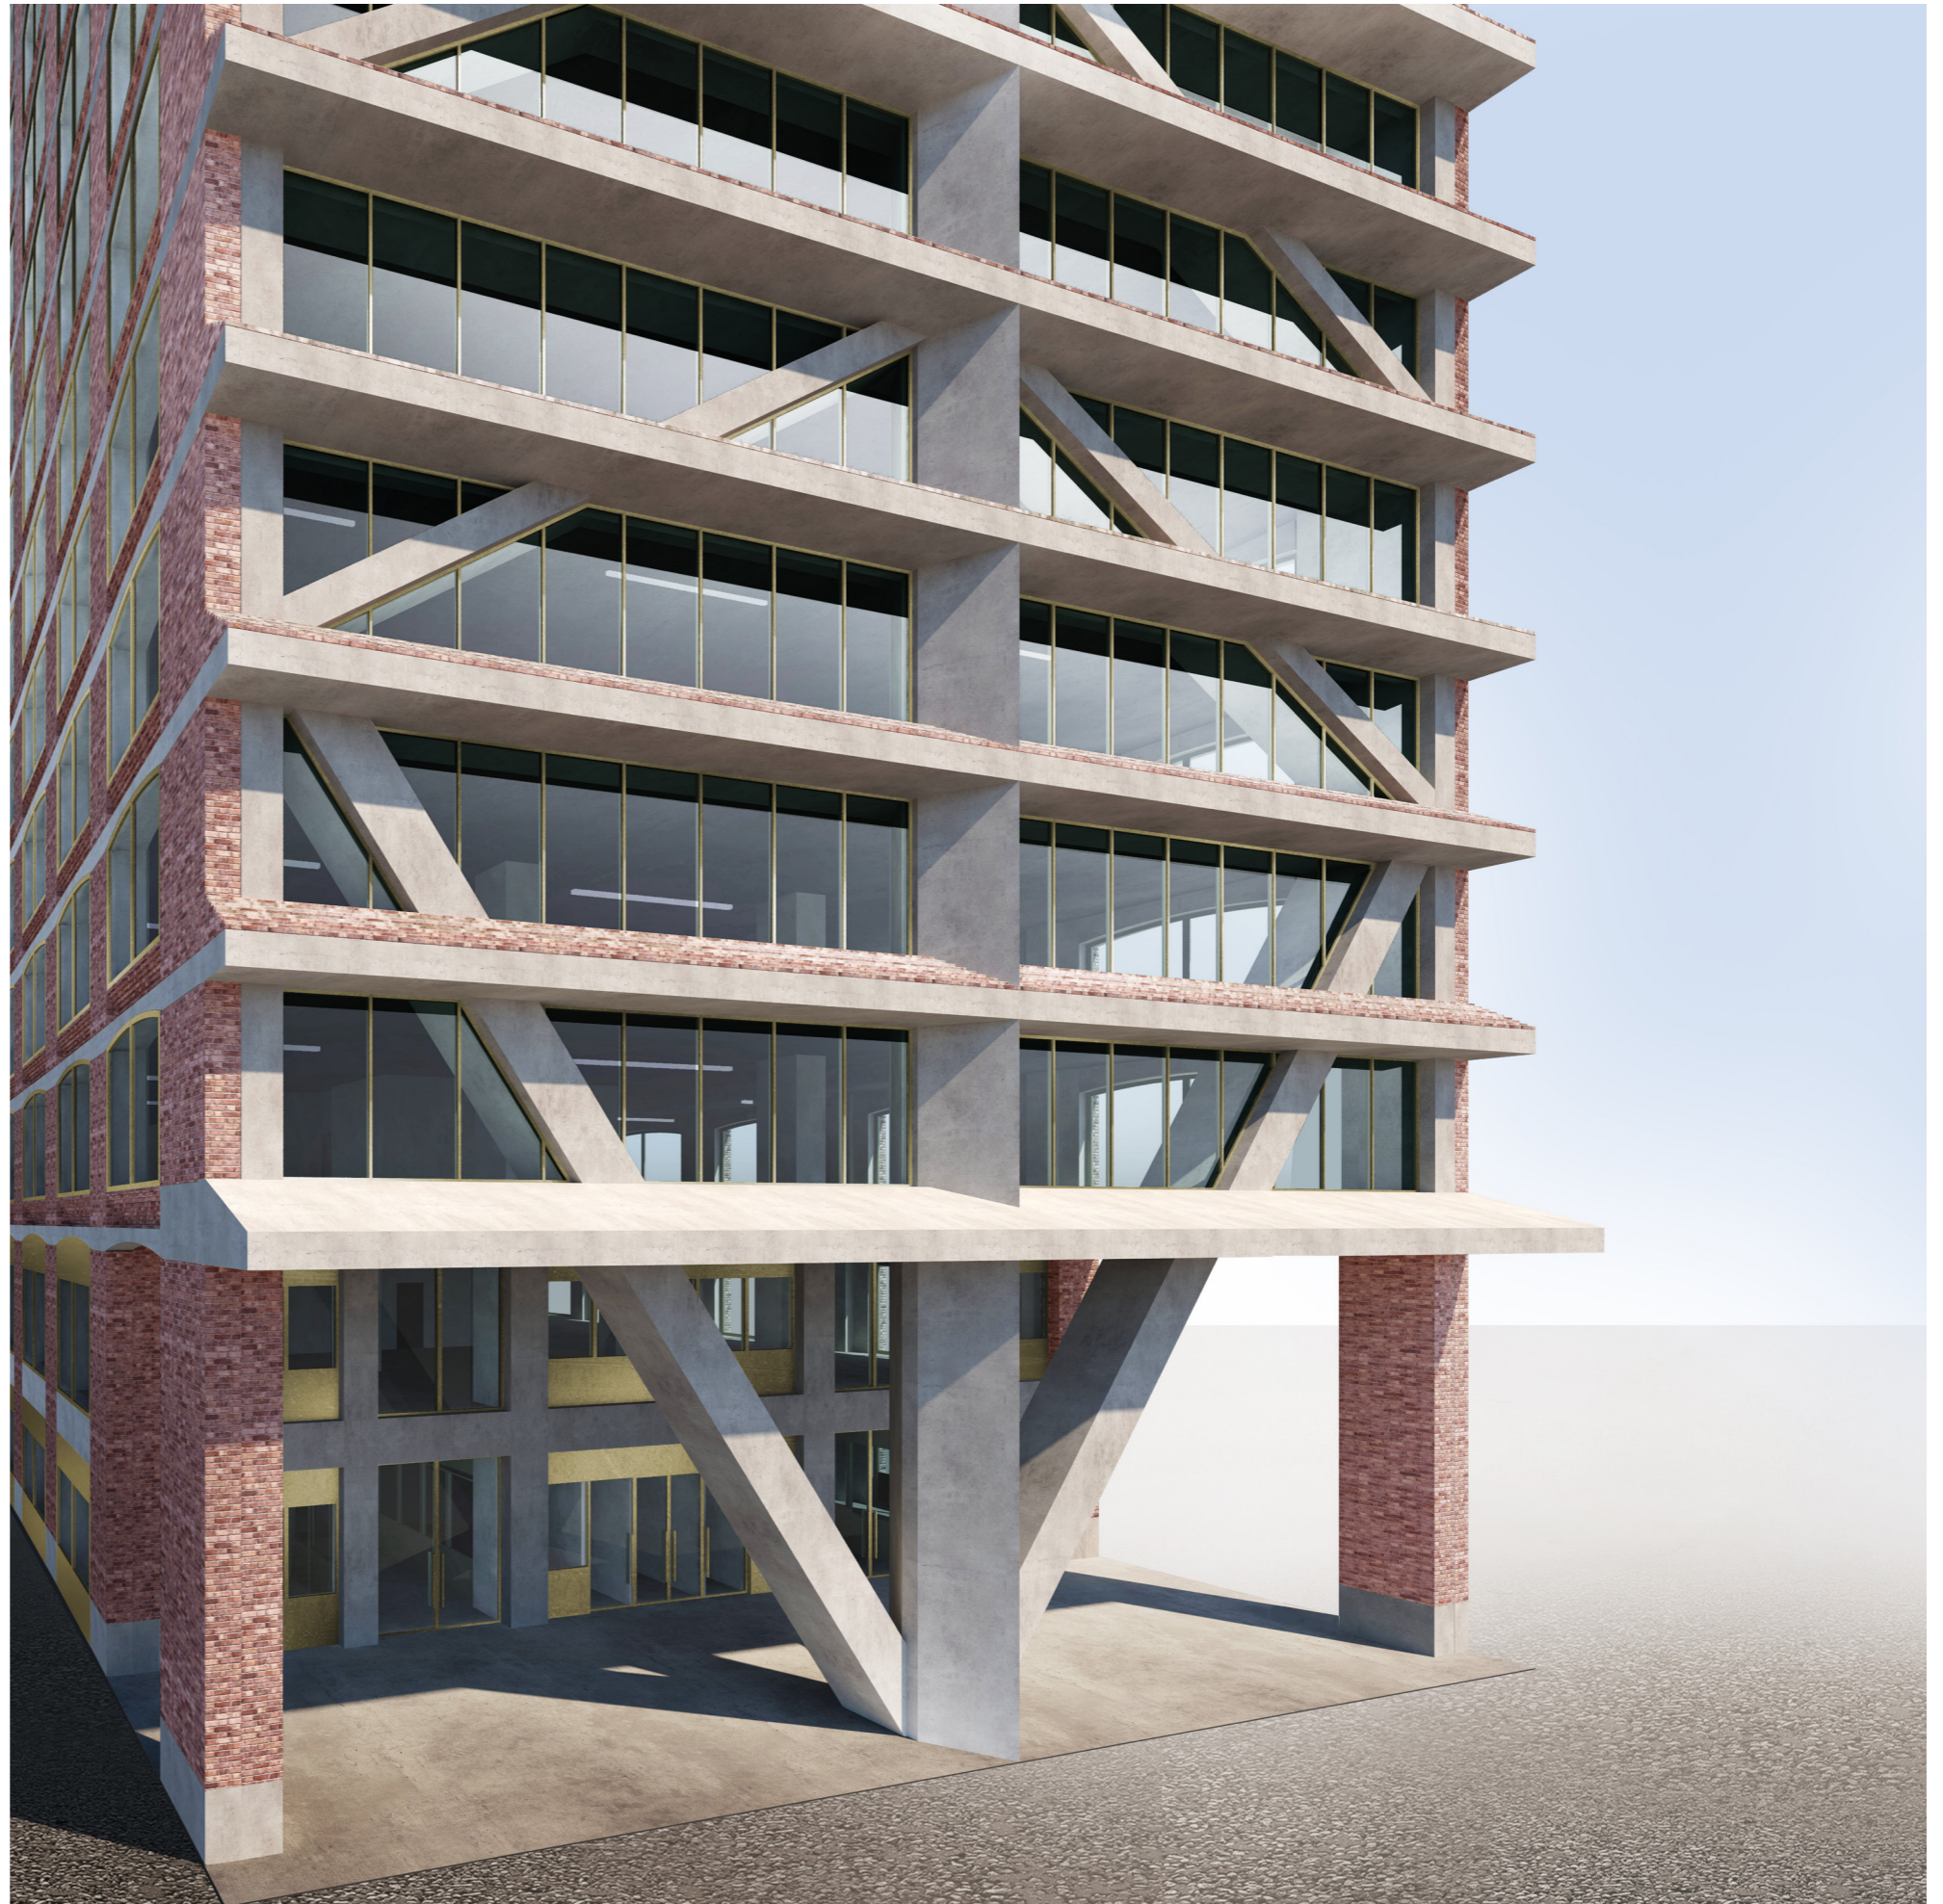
West Façade detail view - bottom & middle
